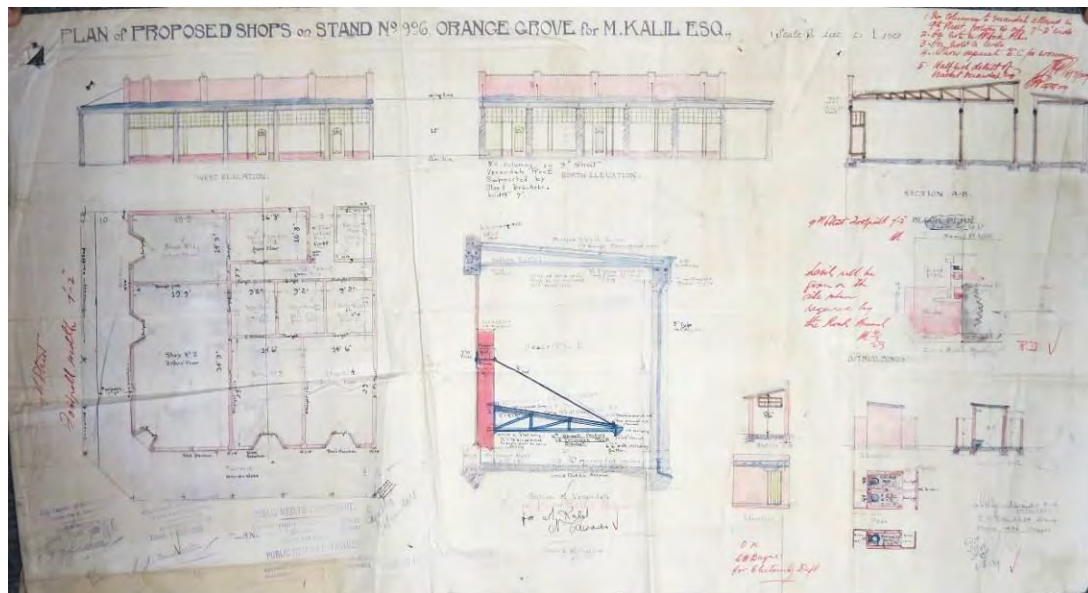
Original plan of proposed Shops on stand 996, Orange Grove
